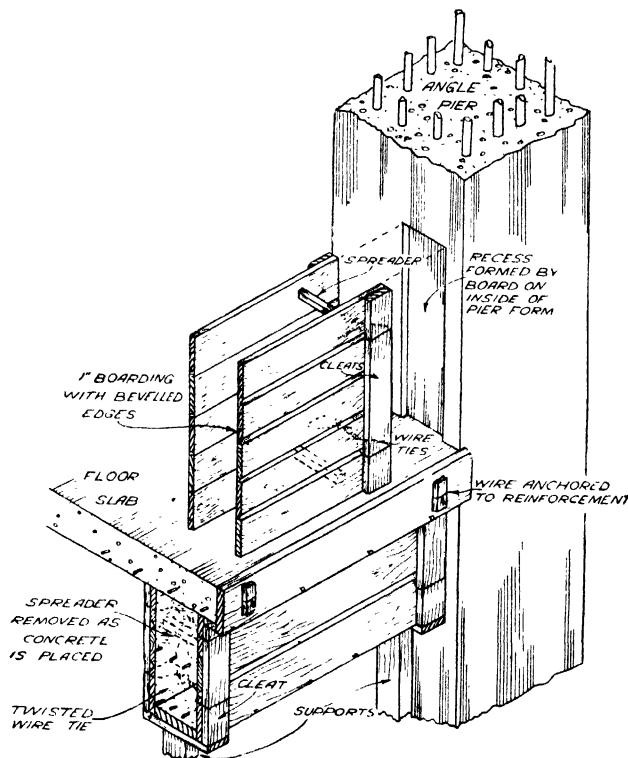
DETAIL OF FORMS FOR LINTEL, EDGE OF FLOOR SLAB AND WALL PANEL AT A IN FIG. 1
